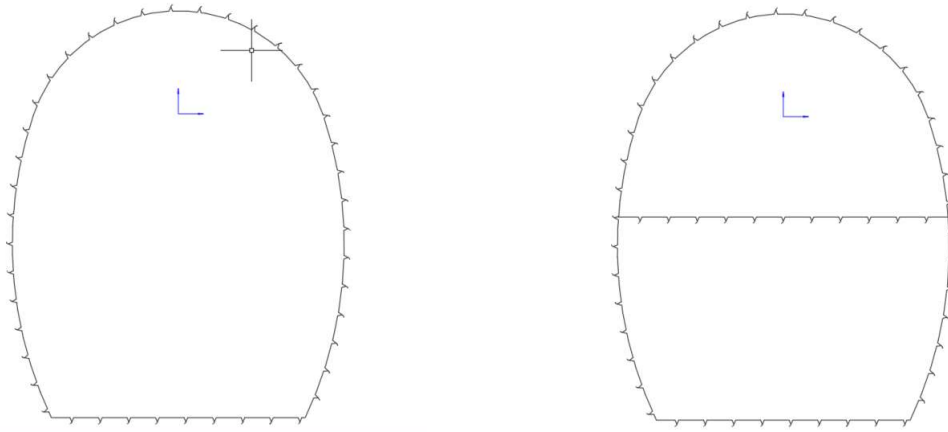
Tunnel type 4 - Full face or phase 1 and 2 excavation
